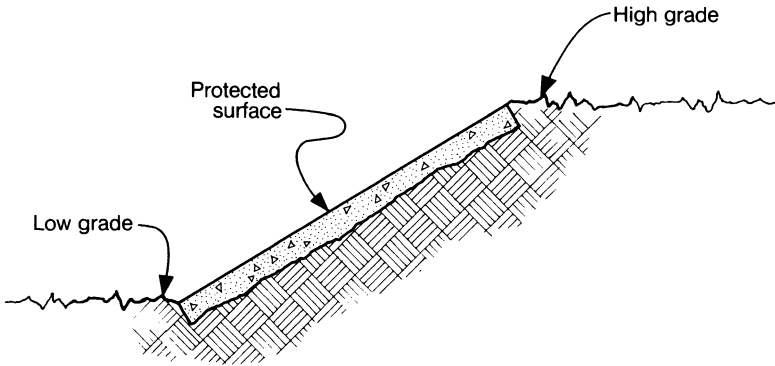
Earth embankment stabilized with a concrete cover.
